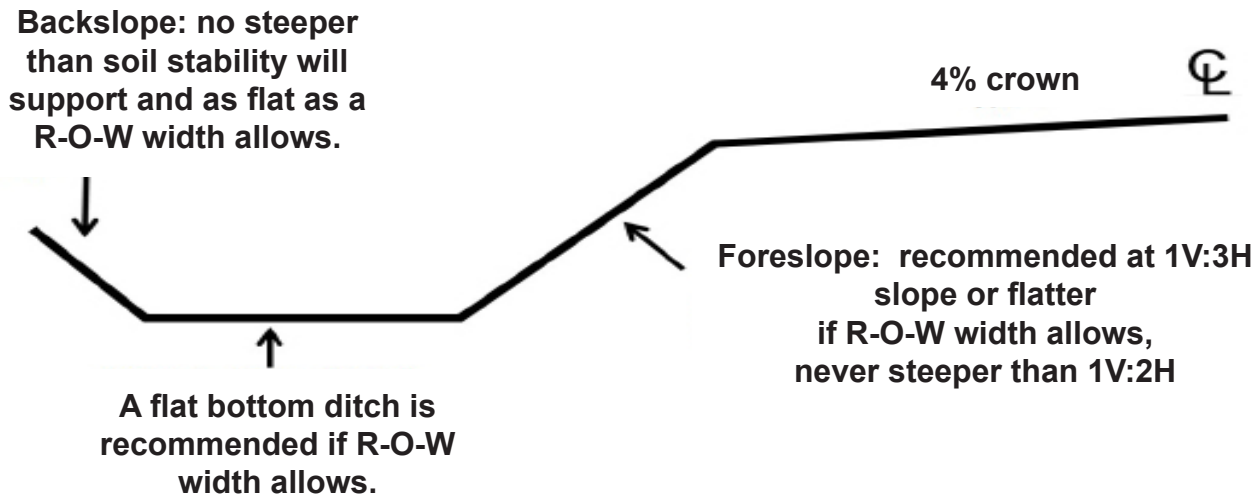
A basic example of what the profile of a reshaped gravel road should look like.
